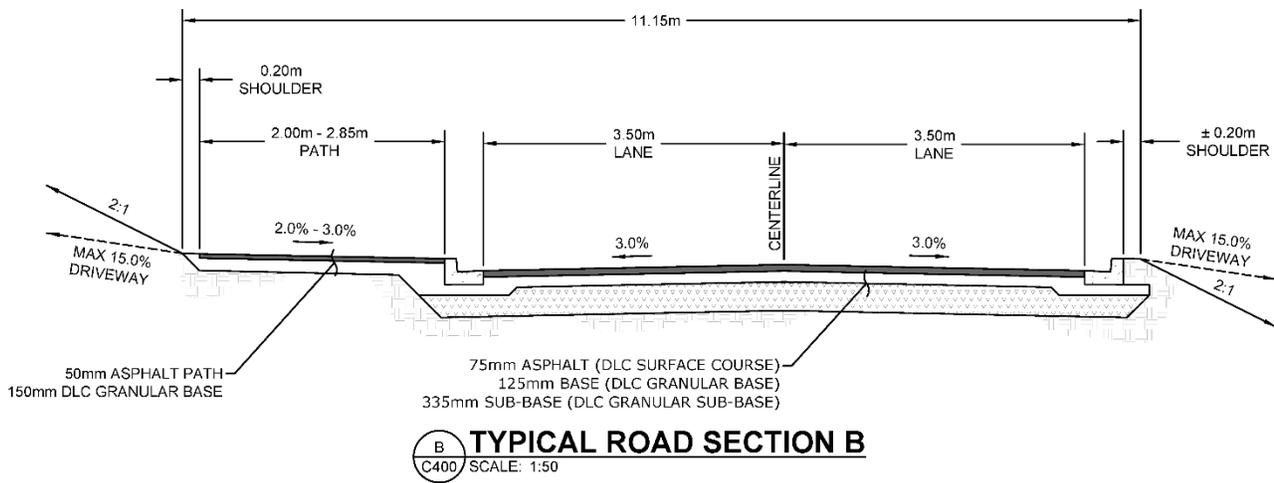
Typical Road Section showing proposed OK Centre Rd E improvements
